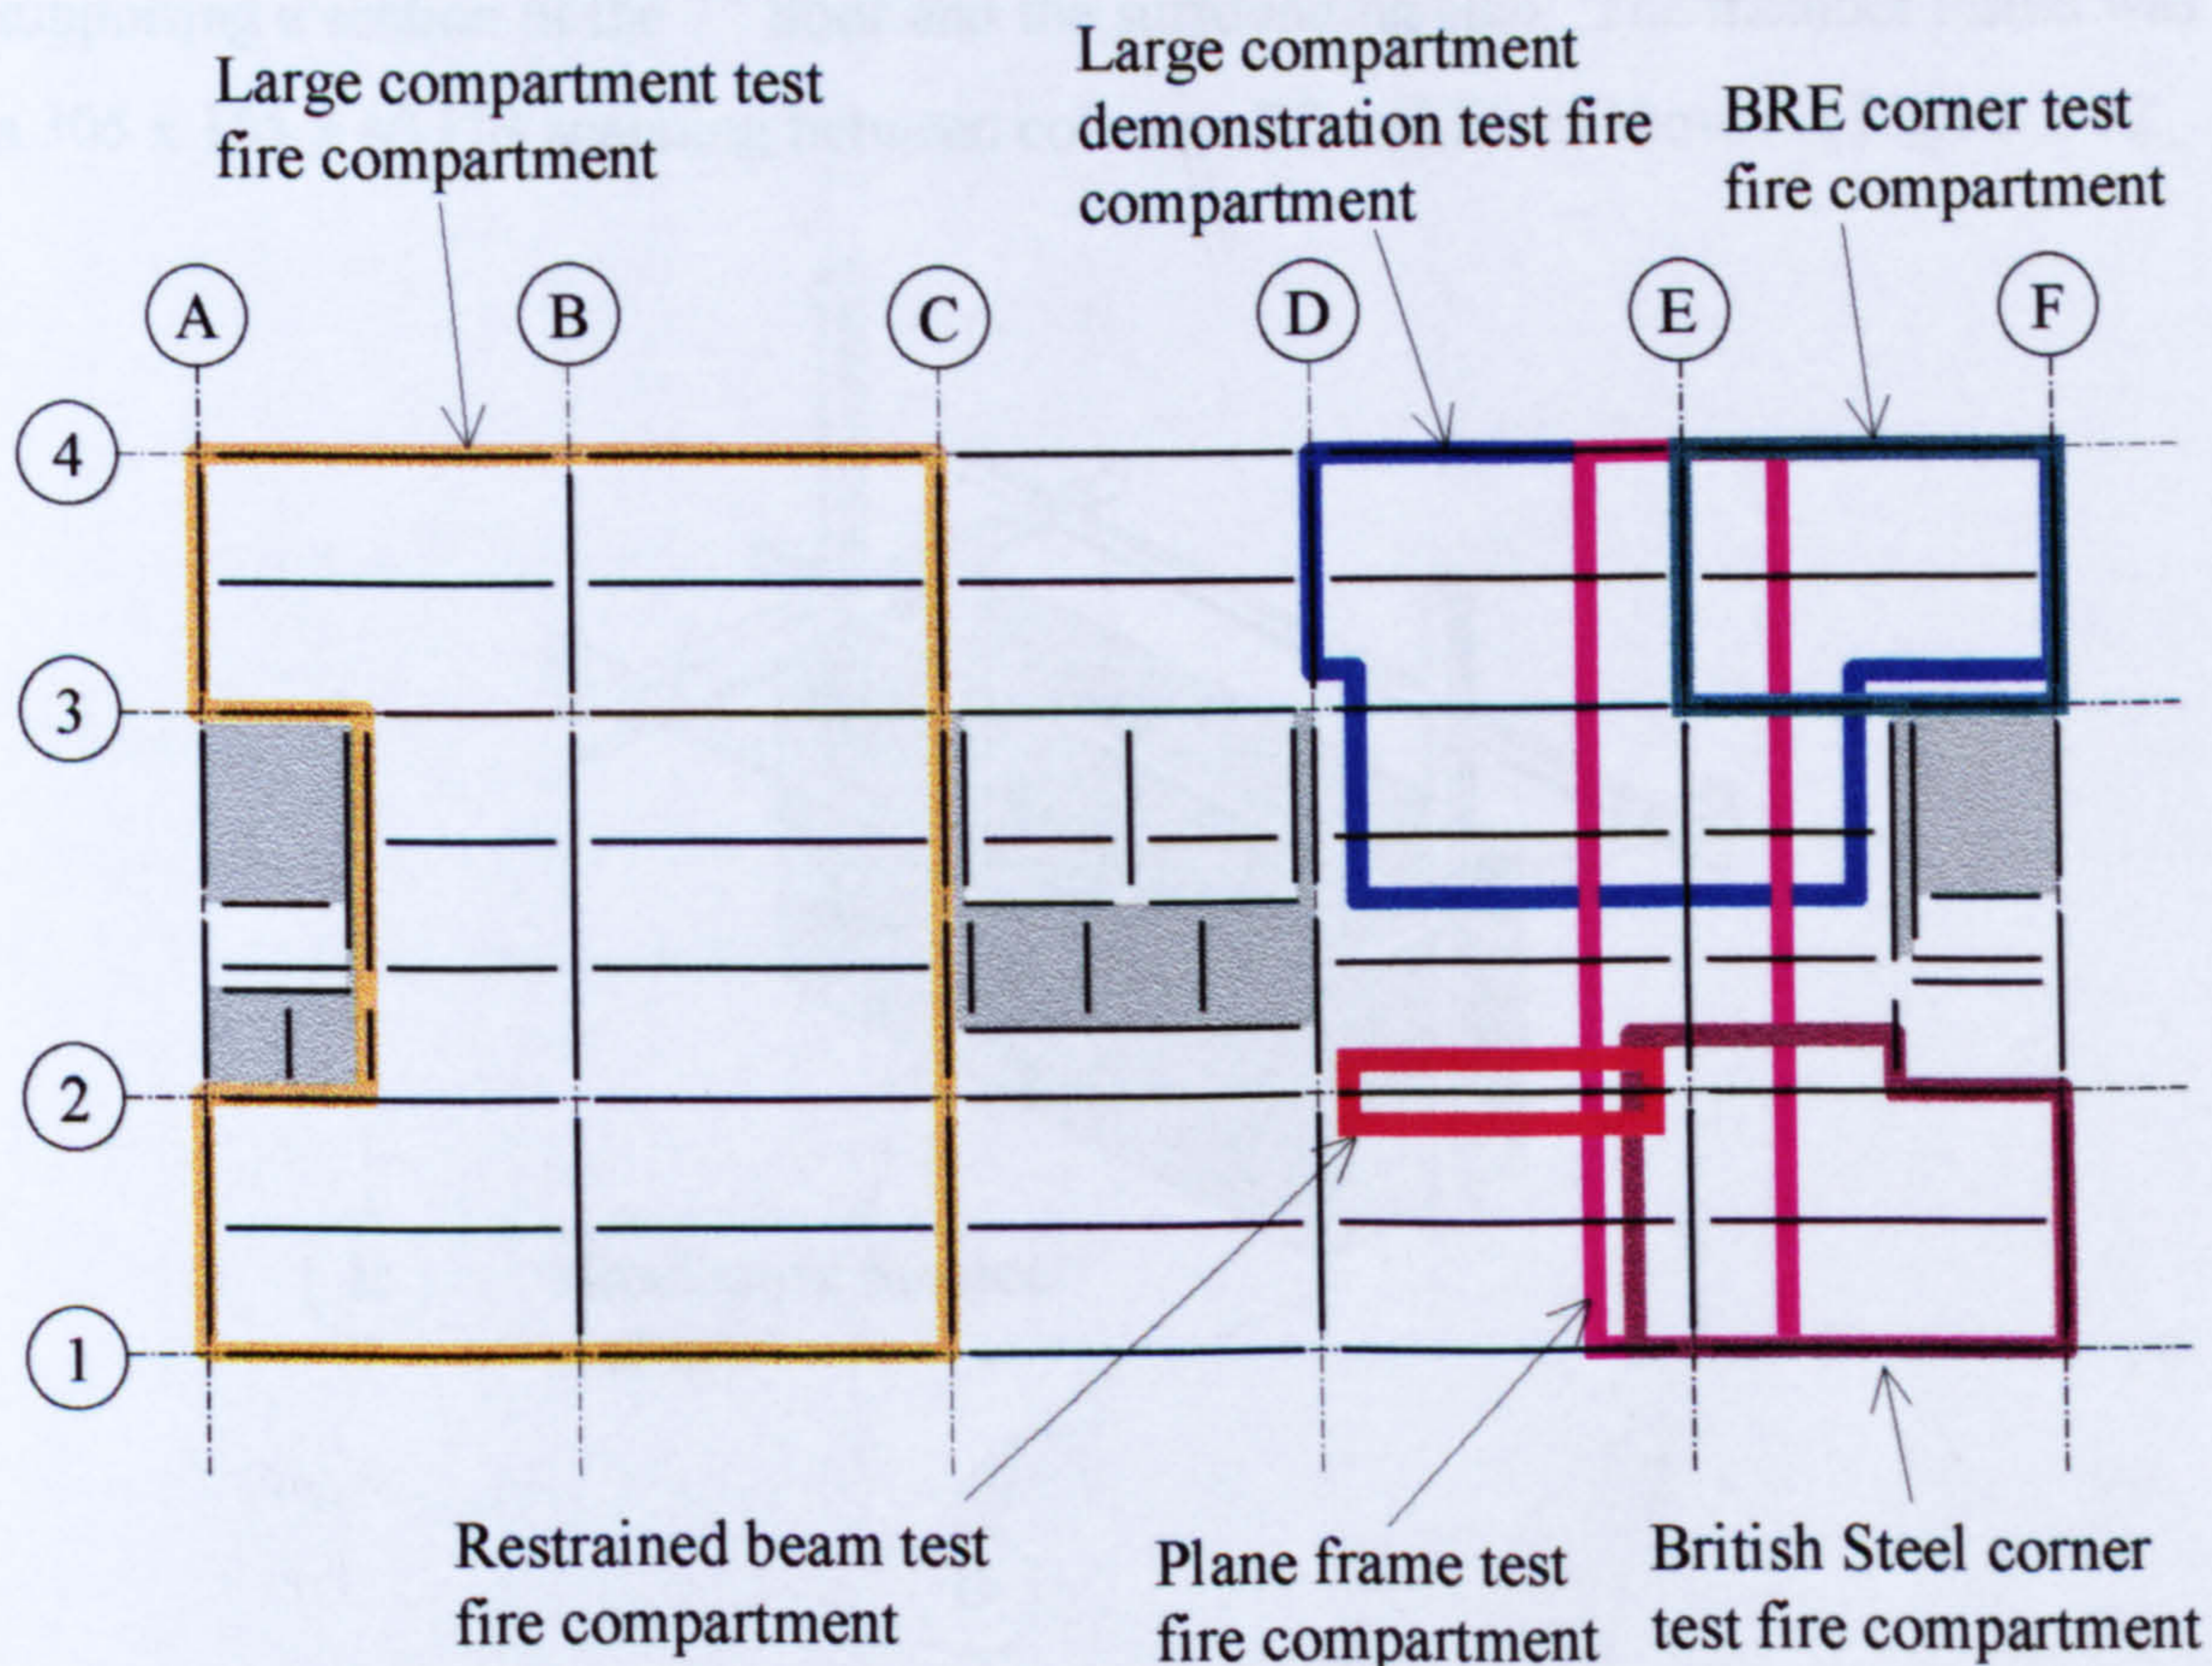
Schematic plan showing locations of the Cardington fire tests
